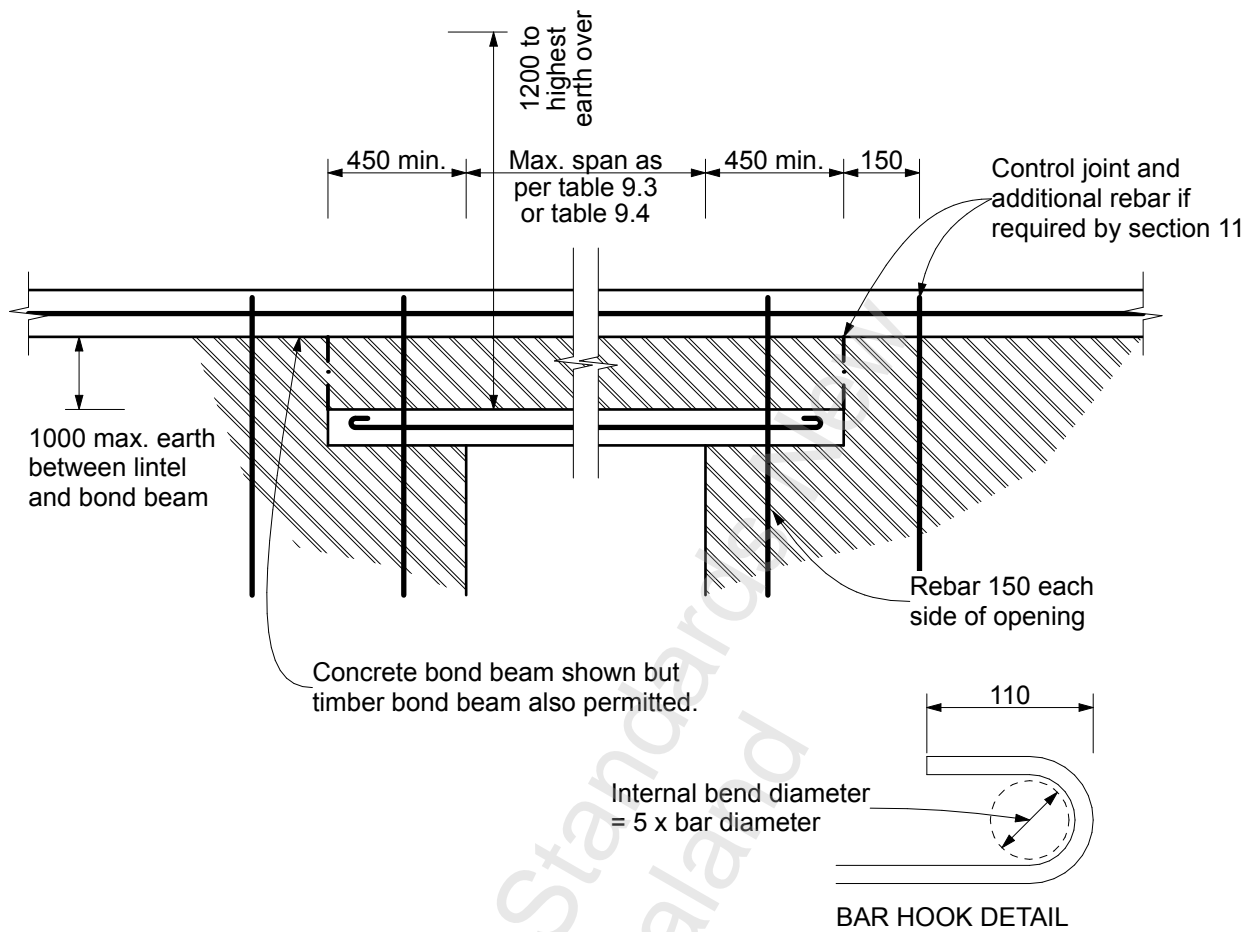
Concrete lintel supporting concrete bond beam and wall above
